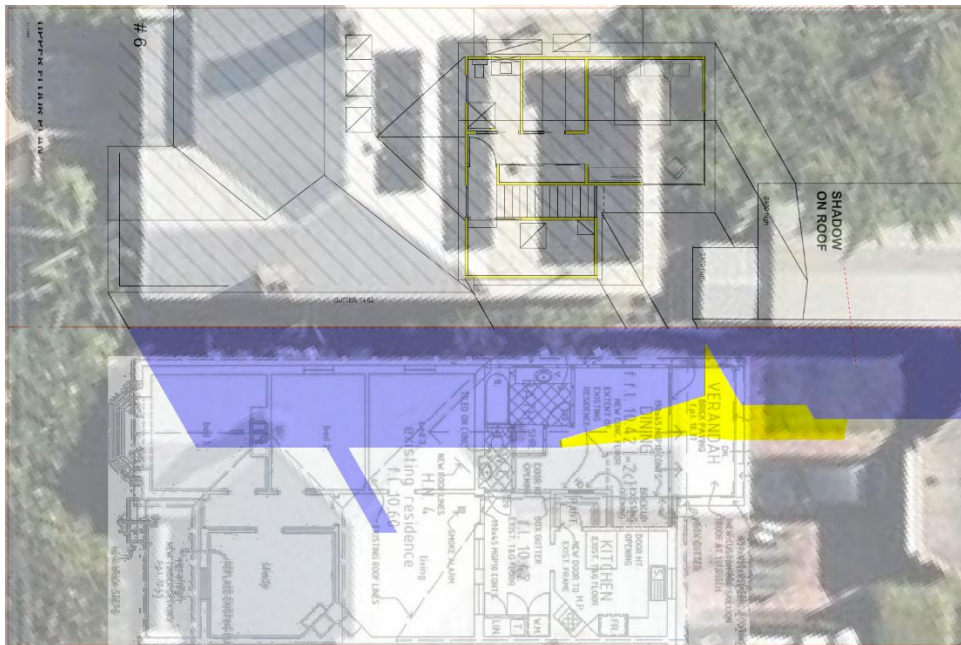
Overshadowing diagram, with purple indicating existing shadow and yellow indicating the additional shadowing proposed by the upper floor extension.
